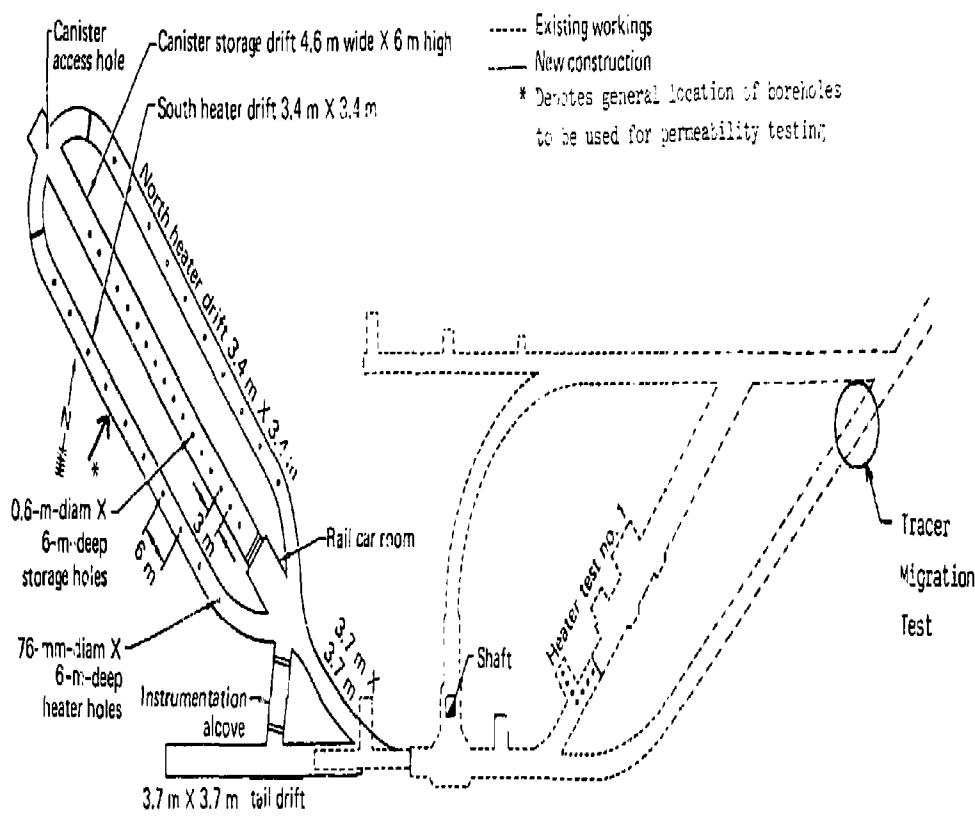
Layout of the spent-fuel-storage-test facility and adjacent workings
